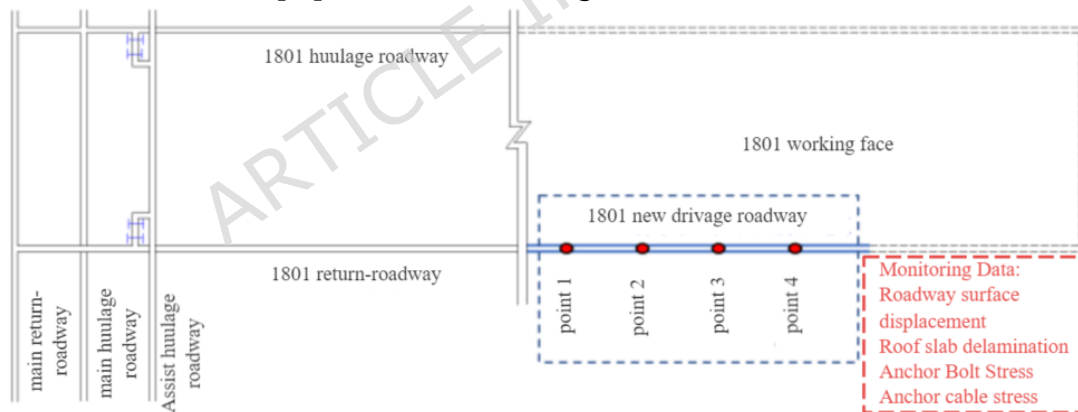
Comprehensive station layout of the new excavation section of the tailgate of the 1801 working face of the No. 5 mine in Dananhu
